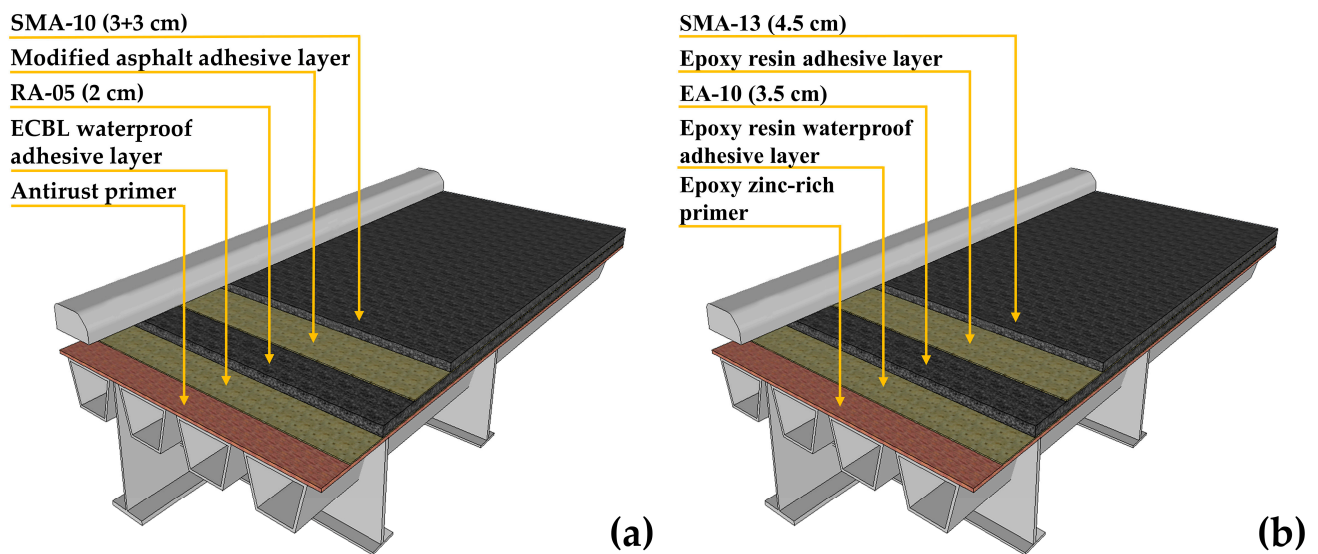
Steel bridge deck resurfacing scheme: (a) Chuanshan direction; (b) Ningbo direction.
